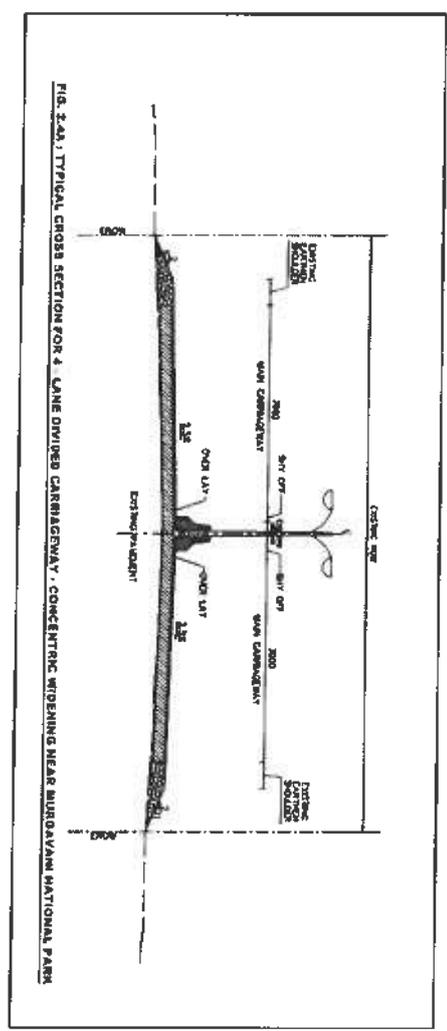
A.1. TYPICAL CROSS SECTION FOR 4 LANE DIVIDED CARRIAGEWAY - CONCENTRIC WIDENING NEAR MURDASANI NATIONAL PARK
